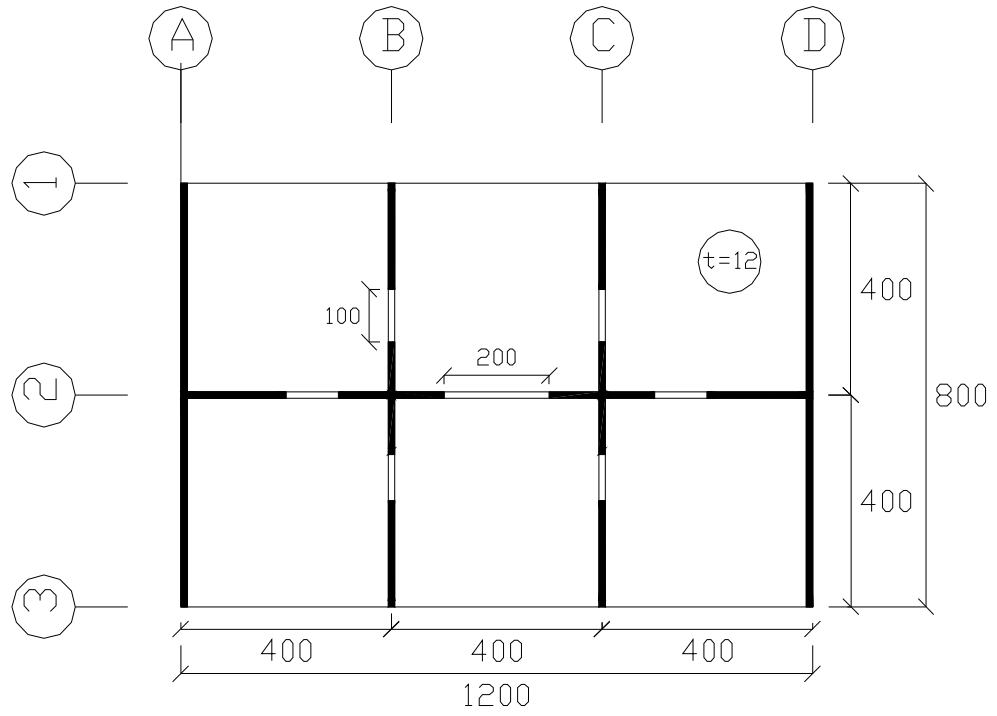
Typical plan view – Plan No. 6 (units in cm)
